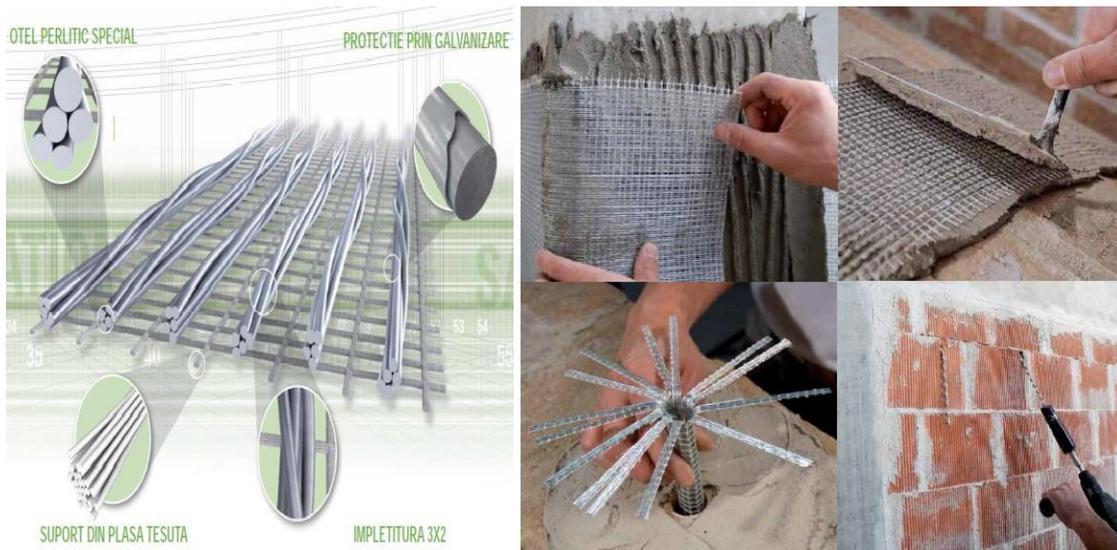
GeoSteel grid developed by KERAKOLL can be used for RC elements and masonry walls
